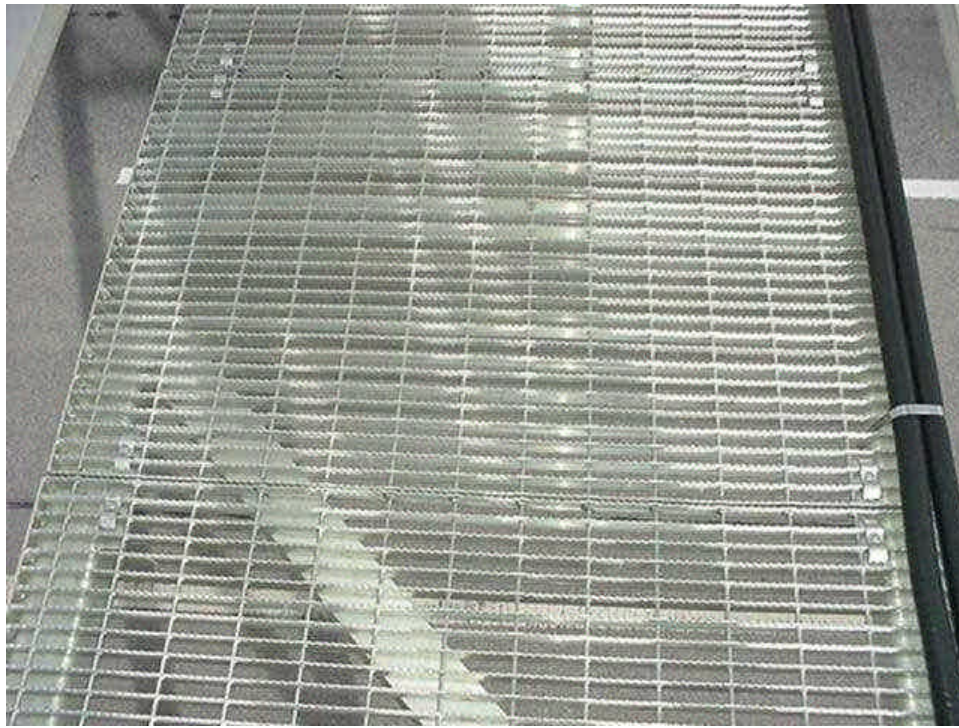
2 Attachment – Walkway Arms, Attached to Bridge Mounted Sign Support
